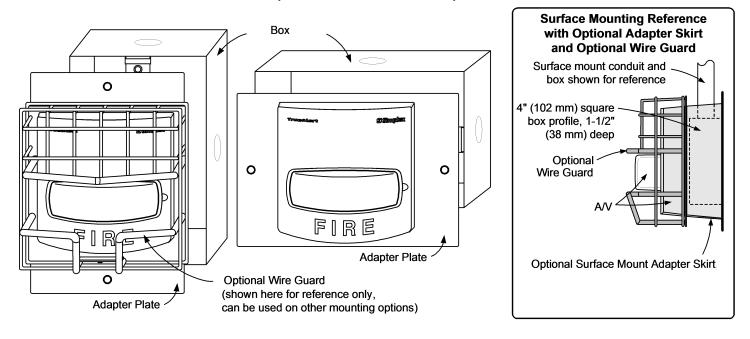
Wall Mount Installation Reference; Adapter Plate, Guard, and Adapter Skirt
